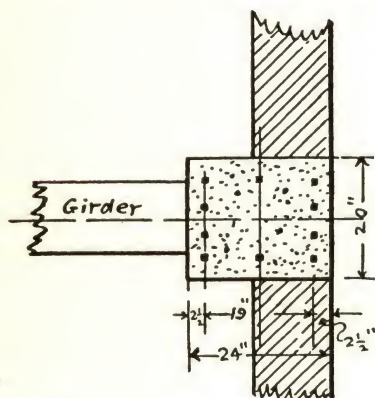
Plan of Girder and Column, the Girder Developing Moment in Column
